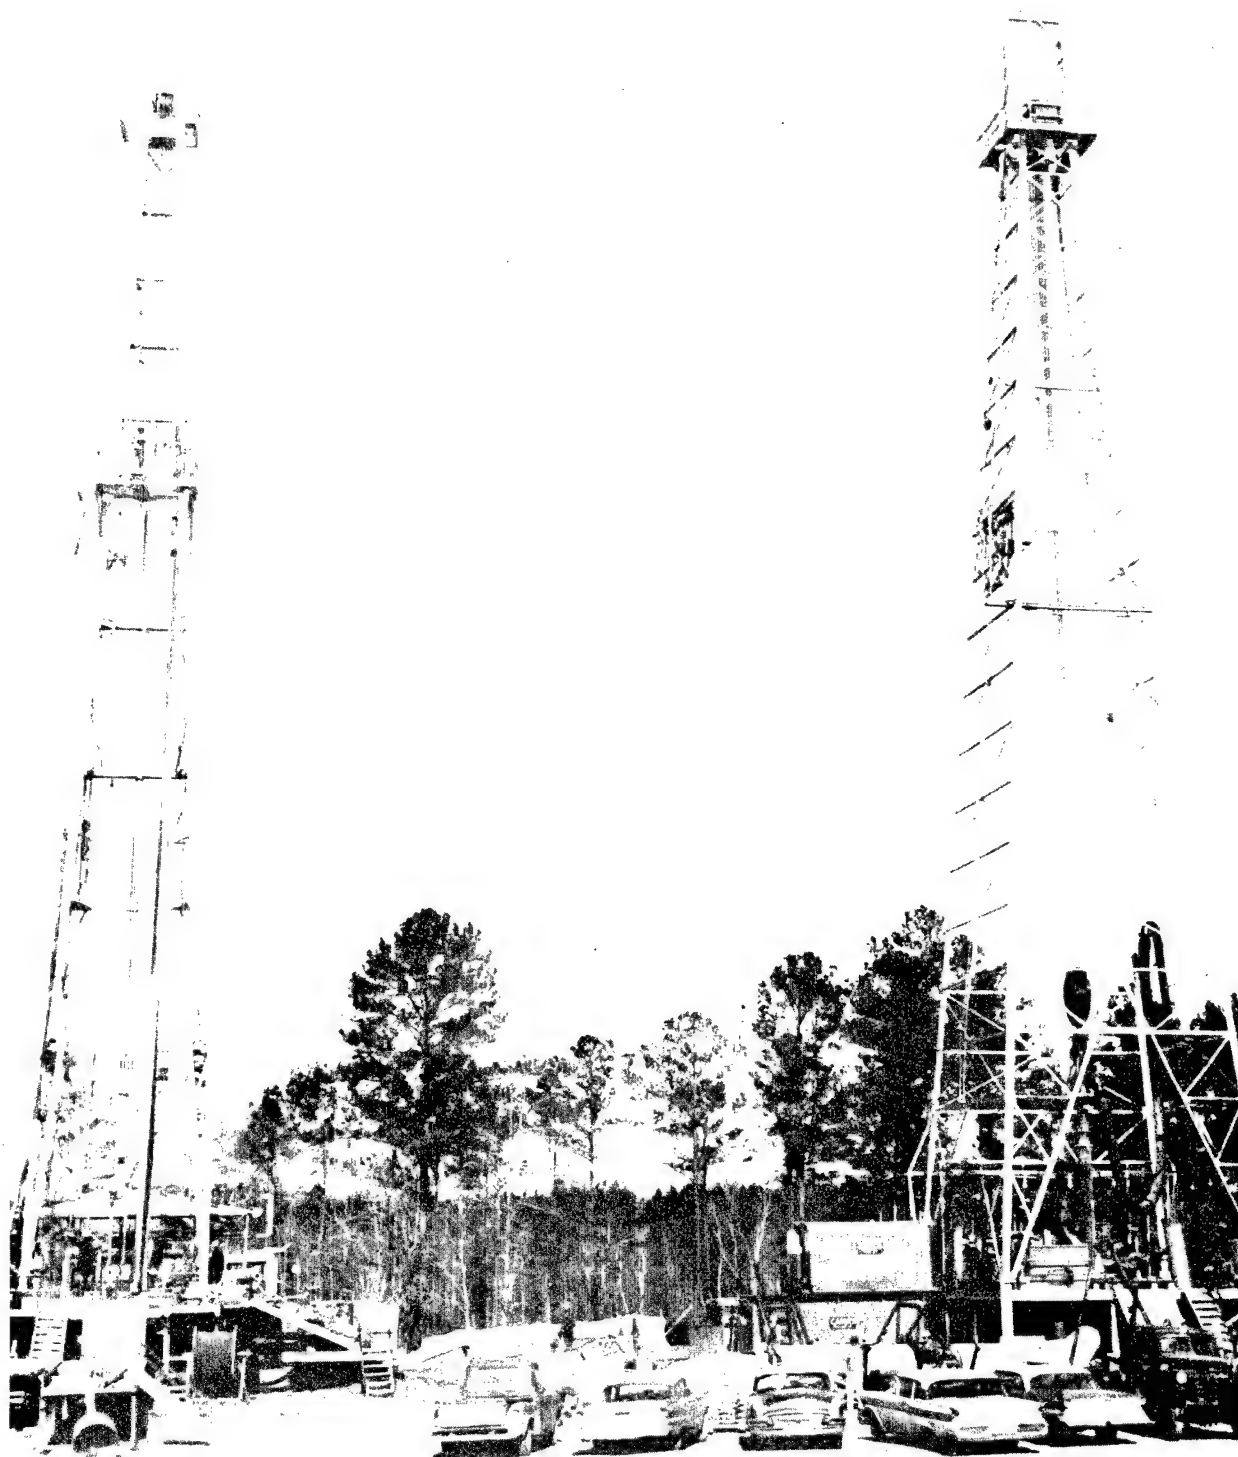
View of two drill rigs over 57" and 88" diameter holes. Photo-Drilling Magazine.
